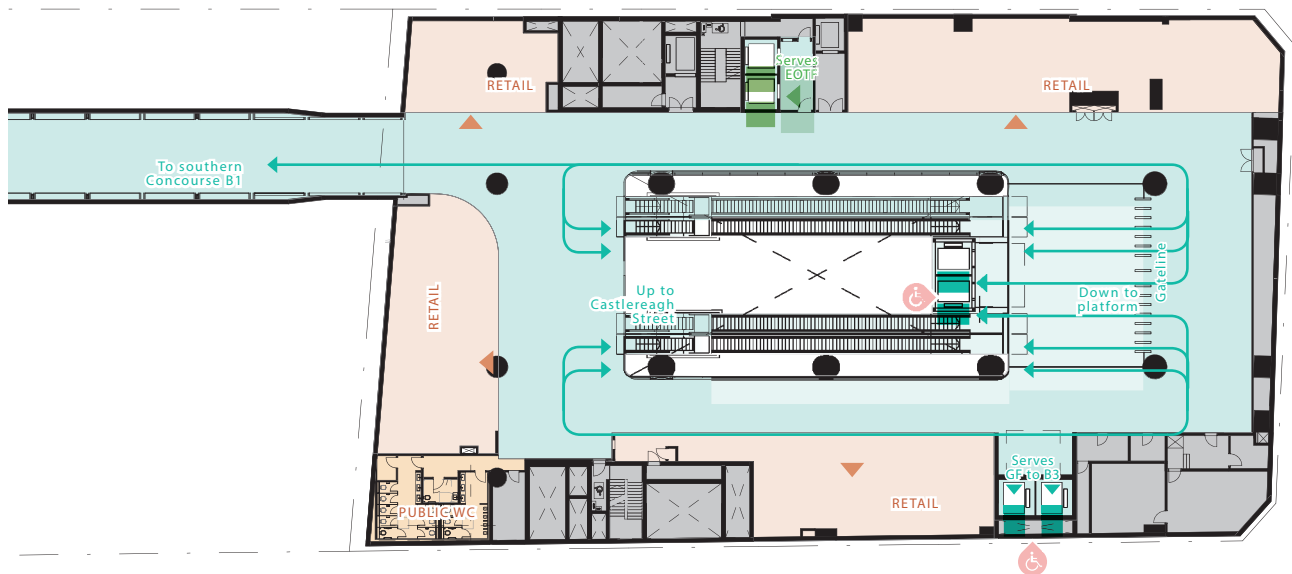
B3 Floor Plan - Concourse by Grimshaw
